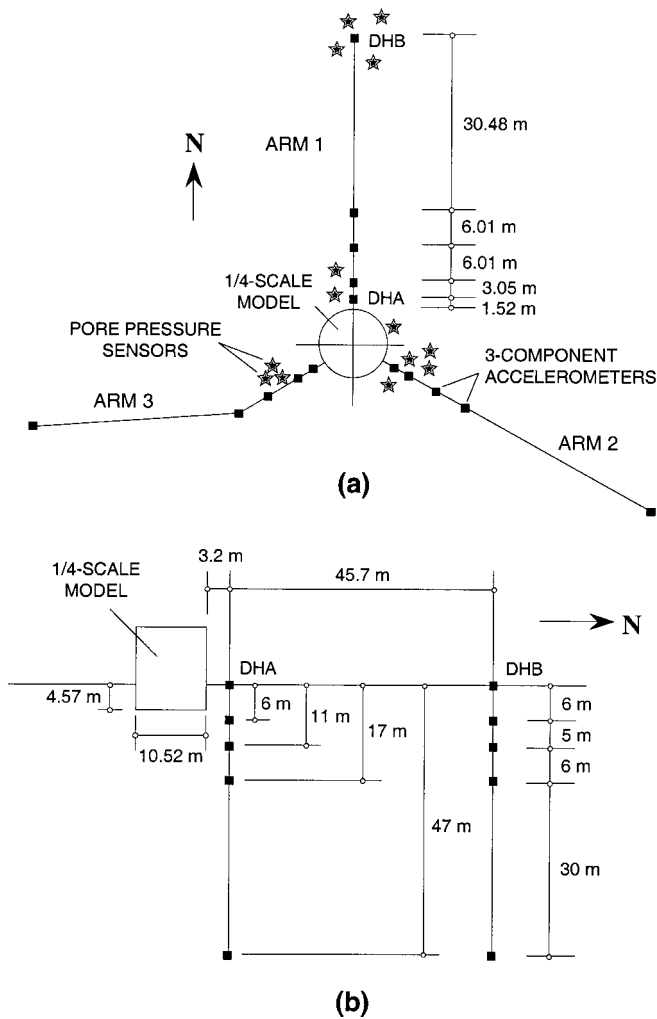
Location of surface and downhole instrumentation, Large-Scale Seismic Test site: (a) plan; (b) elevation
